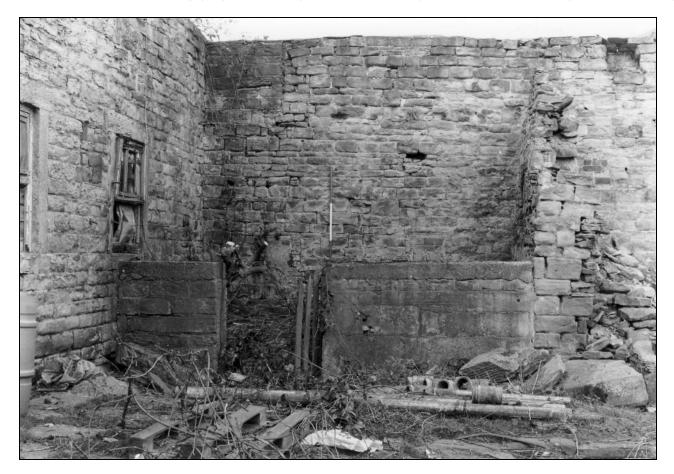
Remains of building at north-east corner of building 1a (coal store?), from the south (film 1, frame 17)
